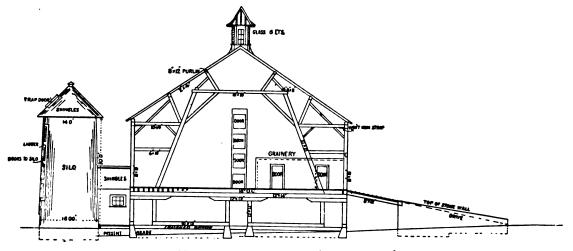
WHITEHALL FARM BARN (END ELEVATION).
